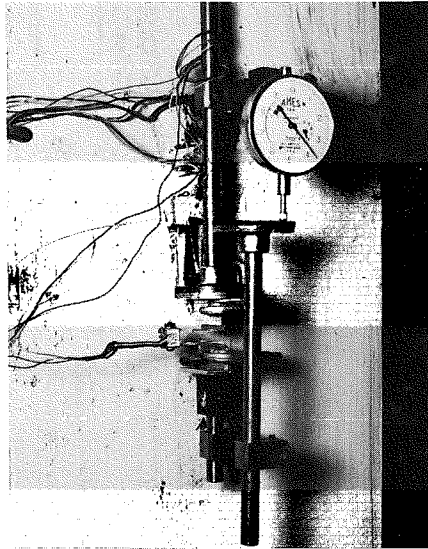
The Dial Gage and Electrical Clip Gage Over 10 inch Gage Length of Stub Column
